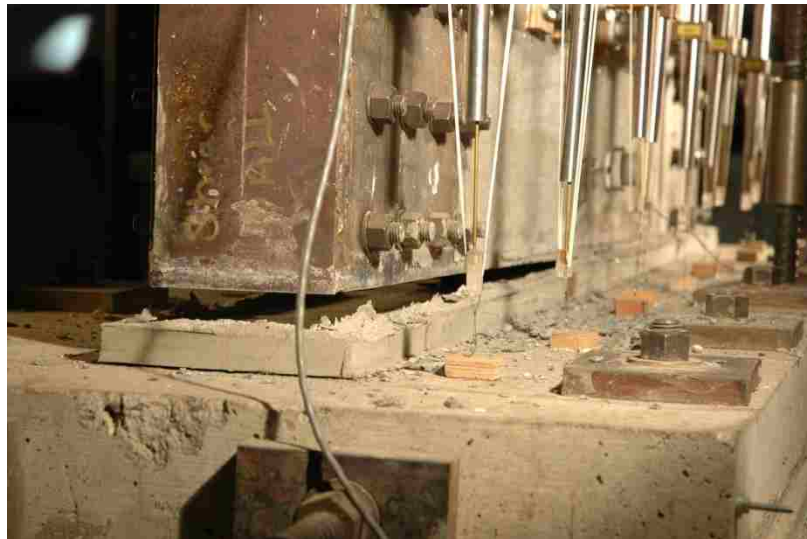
Gap Opening at 1.5% Roof Drift (Eastward Loading)
